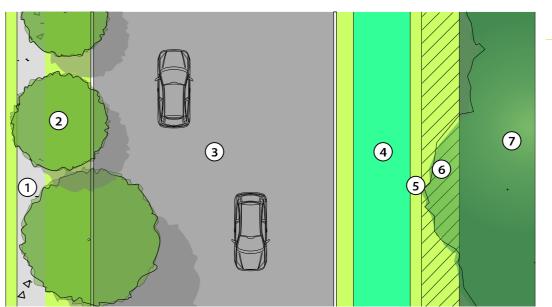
Perimeter Road - Typical Plan (Source: Terras)
